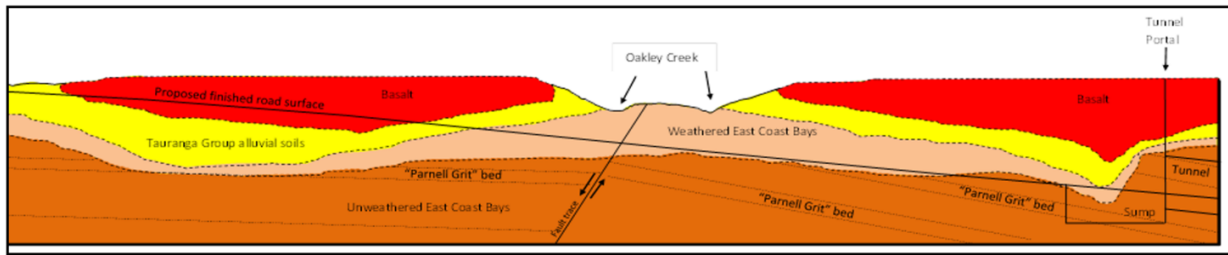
Geological long section through the eastern retaining wall of the Southern Approach Trench
